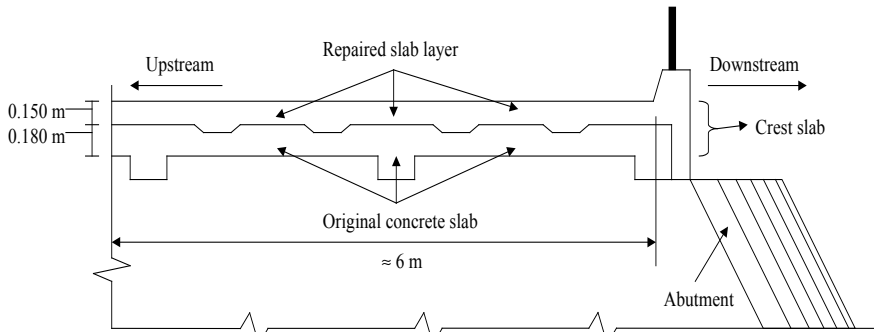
Cross section of the spillway crest slab (drawing not to scale)
